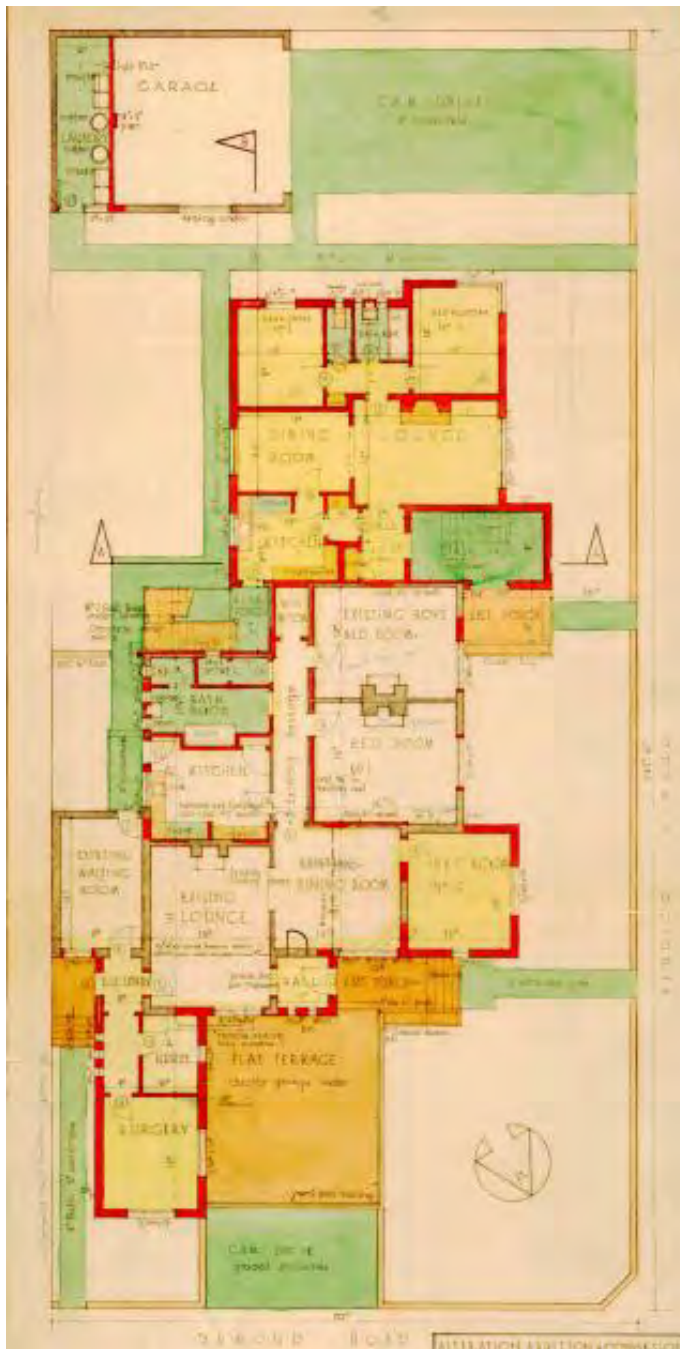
Alteration, addition & conversion to block of 3 storey flats, corner of Ormond Road & Bendigo Avenue, for Mr S. G. L. Catchlove (ground floor plan). Source: Architects R. M. & M. H. King. 1938. Drawings of 38 Ormond Road, Elwood. Council Records. City of Port Phillip.
